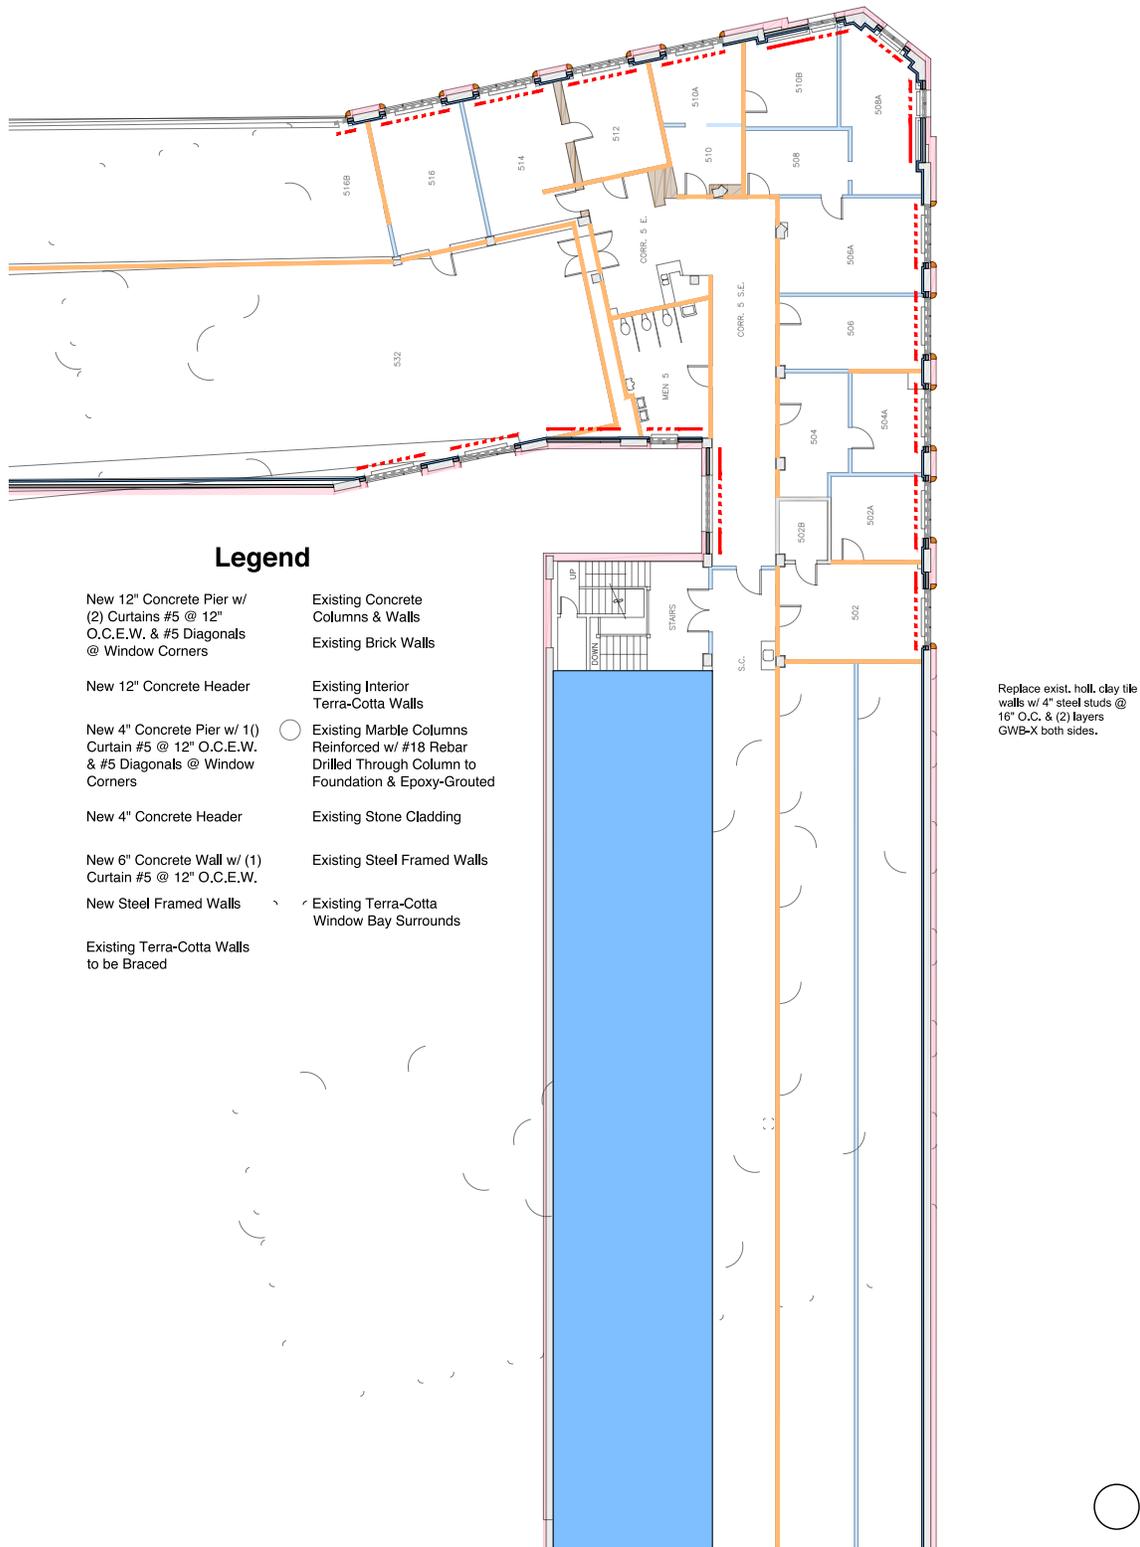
(7): Recom. HCT Wall Bracing/Replacement Locations-Floor Level 5
